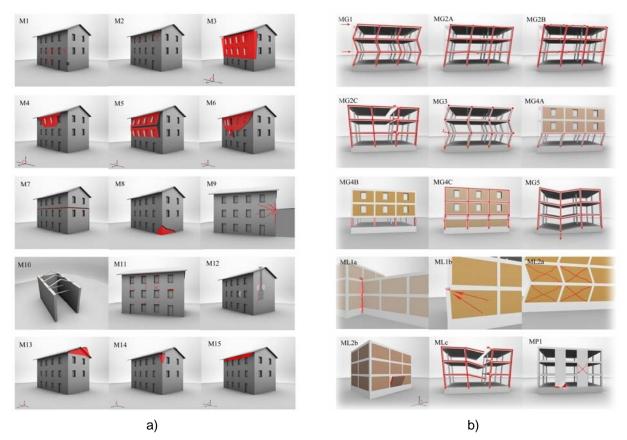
Global mechanisms for: a) masonry buildings; b) reinforced concrete buildings
